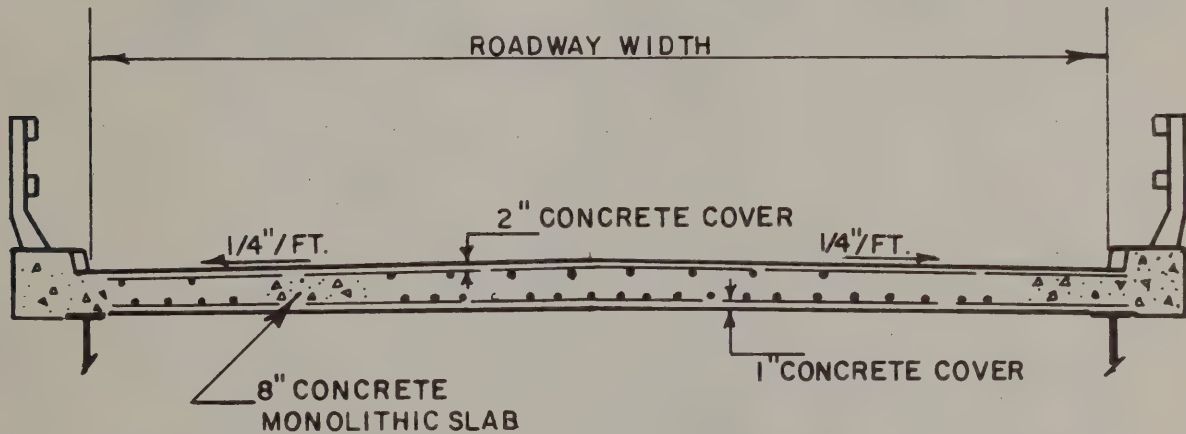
Typical Transverse Section 8"- Monolithic Bridge Deck
